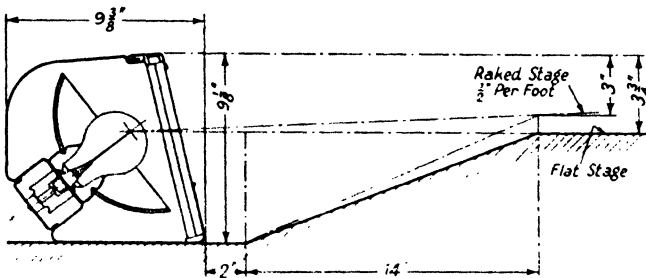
SECTION: USUAL MOUNTING OF FOOTLIGHT
